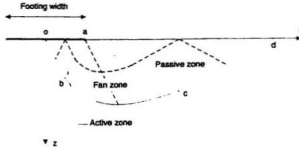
Failure pattern and failure zones of smooth footings
